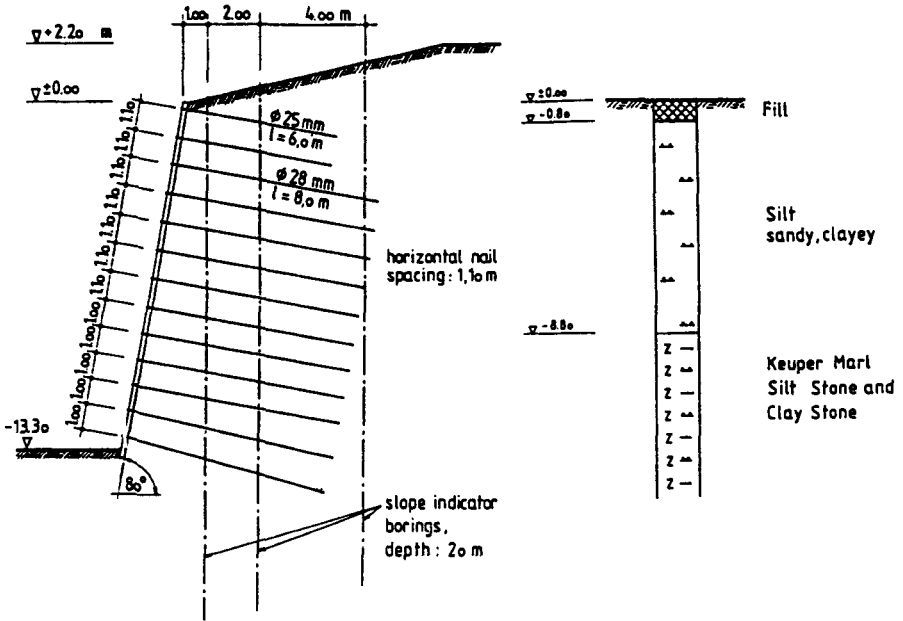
Excavation cross section. (From Stocker and Riedinger, 1990. Reproduced by permission of ASCE.)
